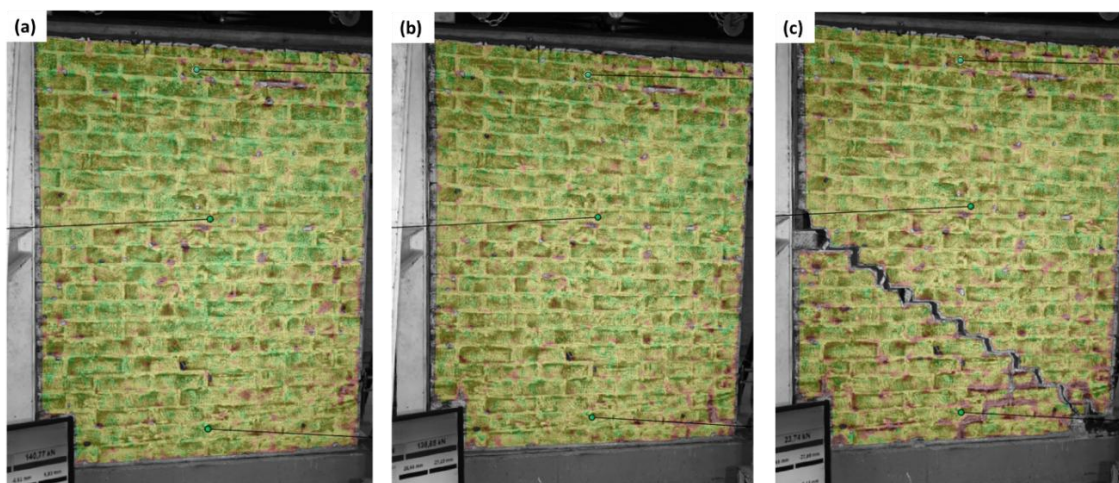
Initial crack at the base with consequent rocking movement (a), minor crack development after rocking movement (b), and (c) failure crack pattern for masonry wall HC_129_A_15.
